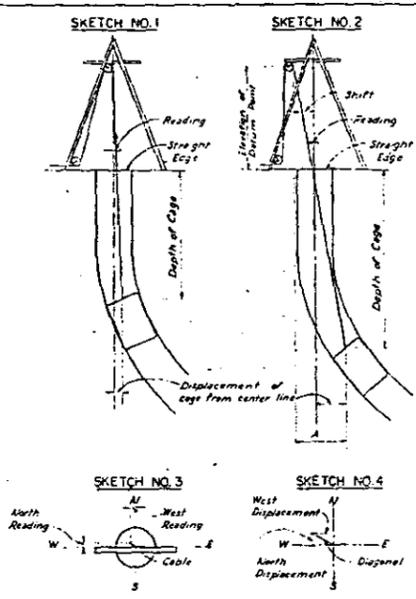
shows an elevation of a well with a cage in the well. And Sketch No. 2 shows a plan view of the top of the well with a straight edge in its true position. In making the measurements indicated it must be remembered that the straight edge was placed by the side of the cable. Since the cable was in the corner of the well, the edge of the straight edge is not quite in a diameter and deflections must always be measured on the same side of the cable that the north-south, east-west lines were determined.
